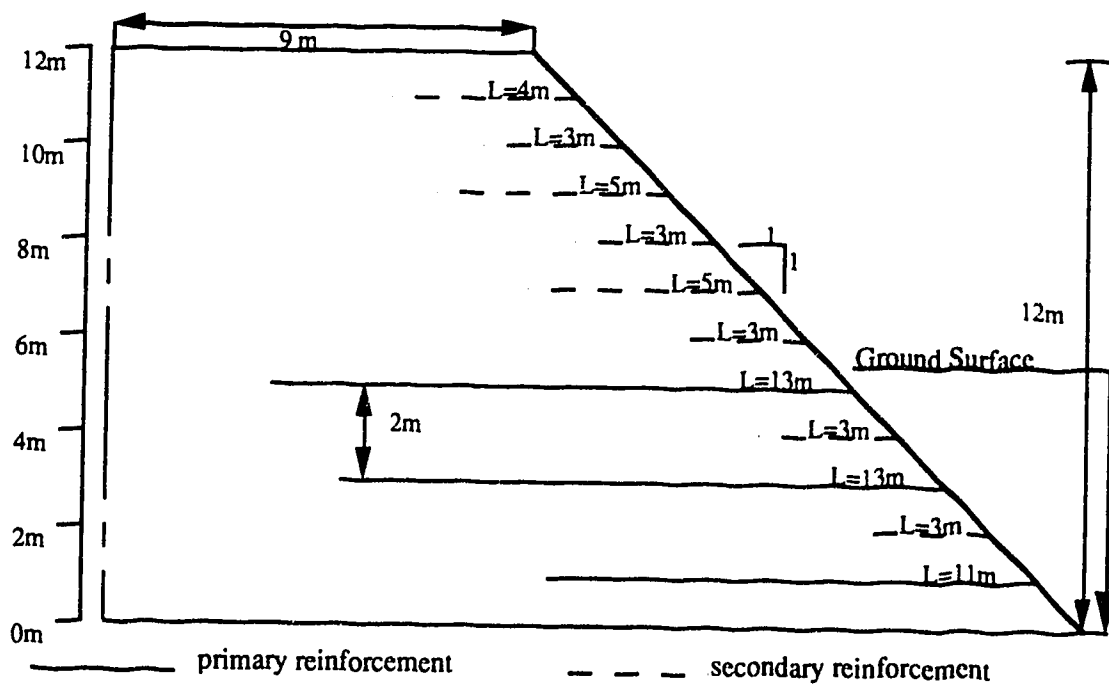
Cross Section and Geogrid Layout of Reinforced Slope
